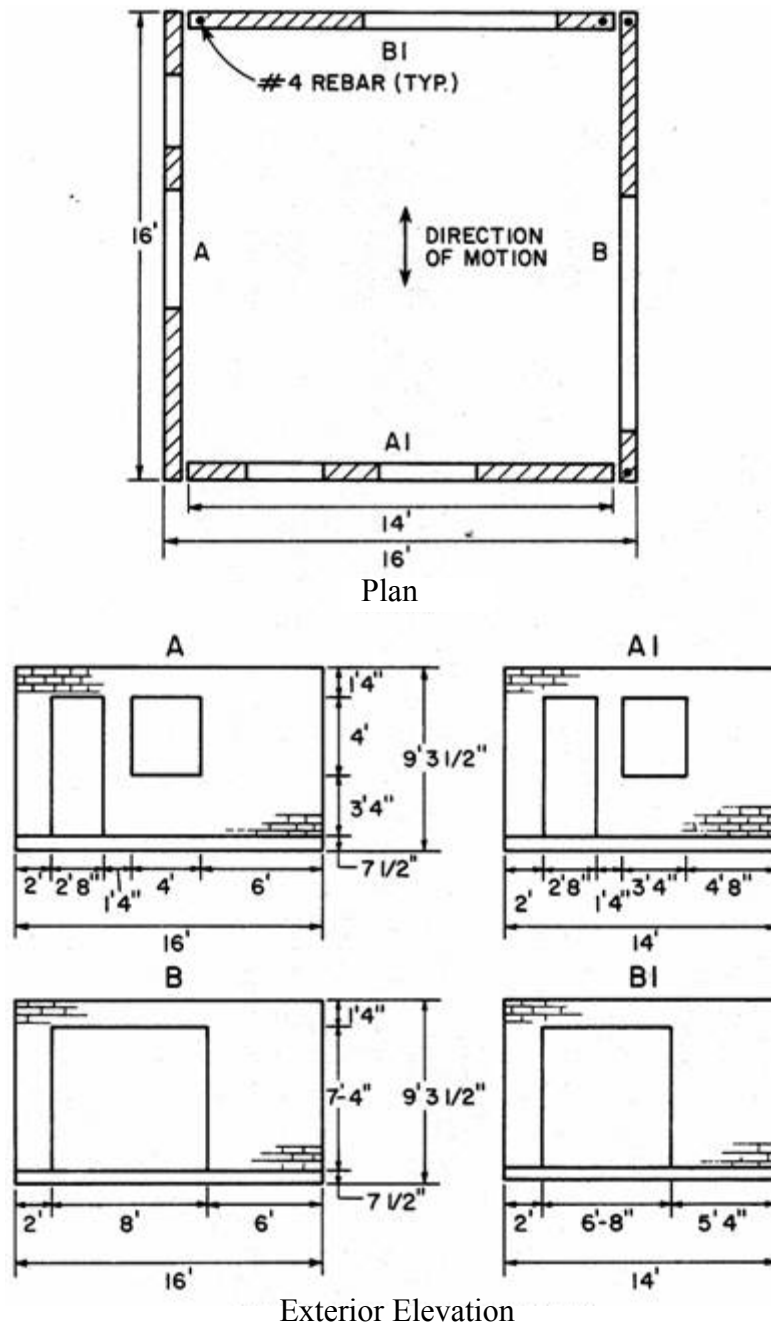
Plan and elevation views of Houses 2 through 4 (taken from Clough et al., 1979).
